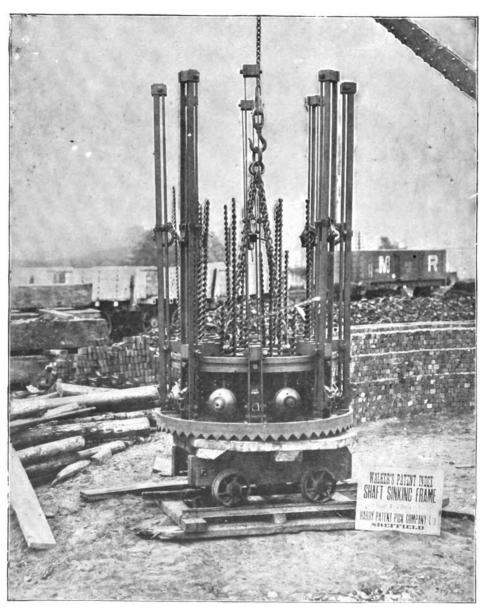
WALKER'S SYSTEM OF SHAFT SINKING WITH ROTARY BORING MACHINES.
